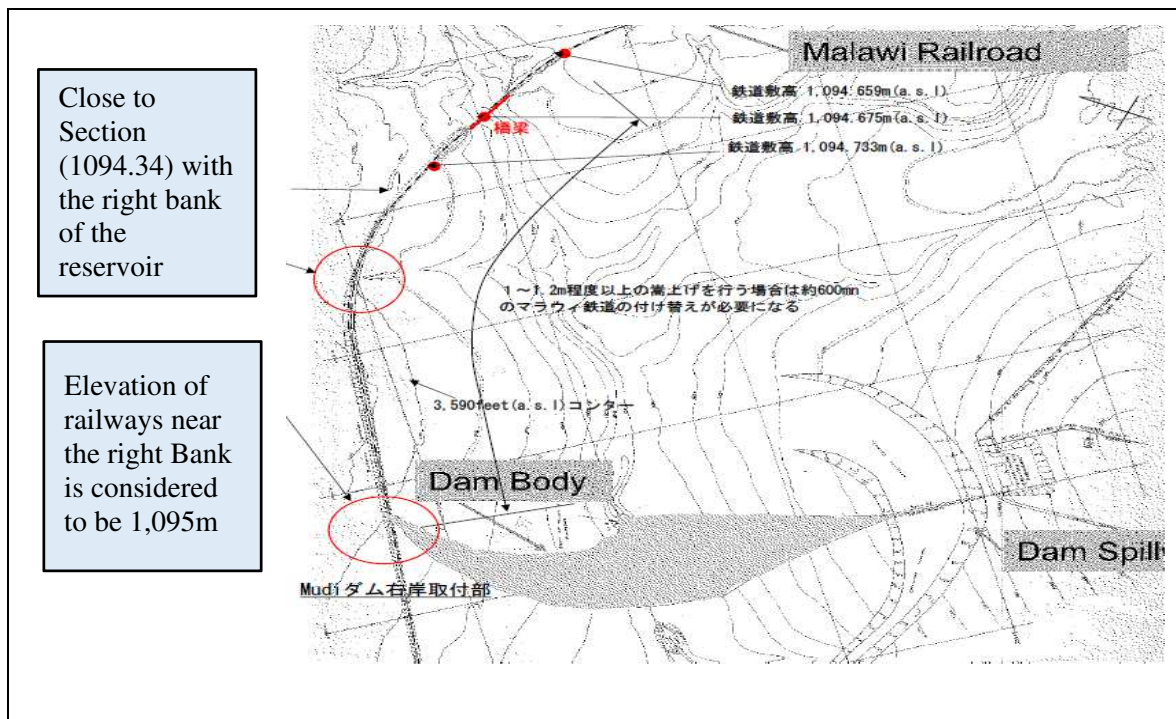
Railway Bridge of Malawi Railroads
